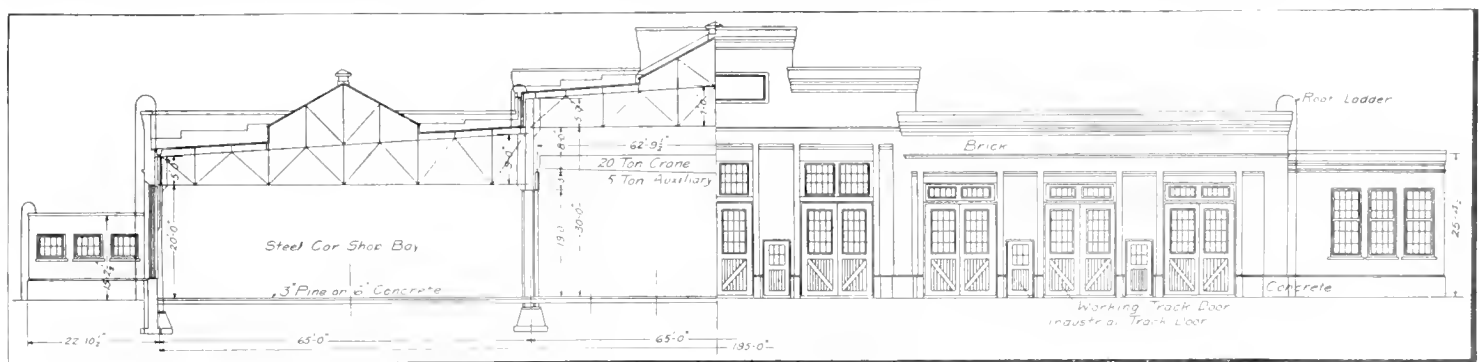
Cross Section and End Elevation of Freight Car Shop.
